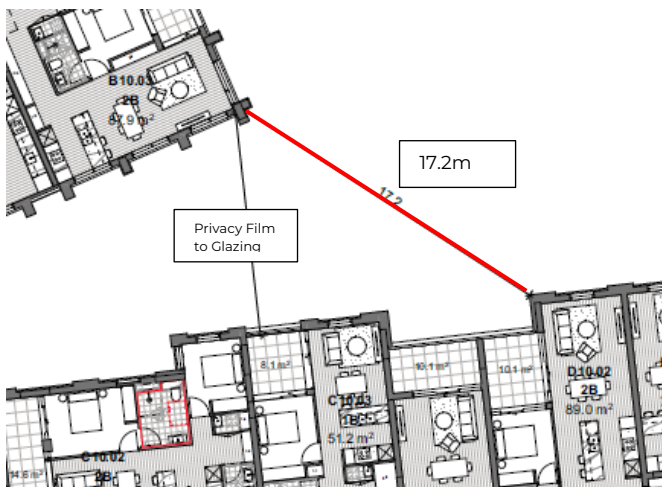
Building Separation Between Building 2.1 and Building 2.3
